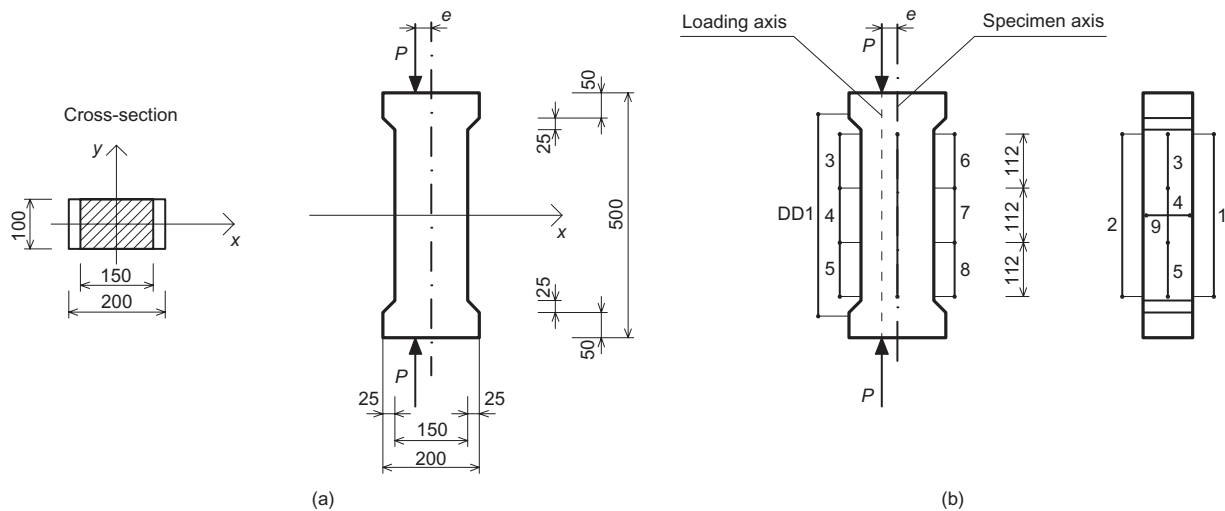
Eccentric compression tests²²: typical specimen dimensions (a); arrangement of the measuring instruments (b)
